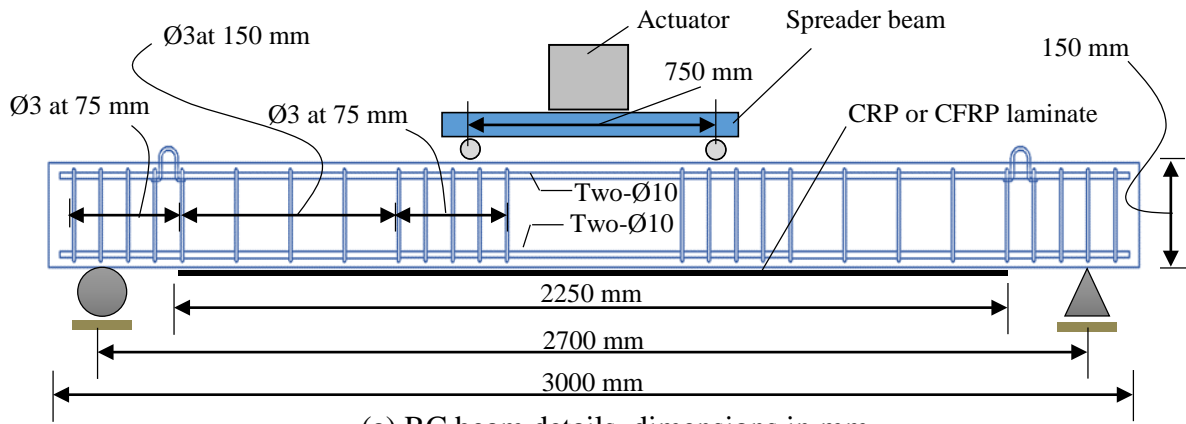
Geometry of RC beams and CFRP laminate strengthening layout (dimensions in mm).
